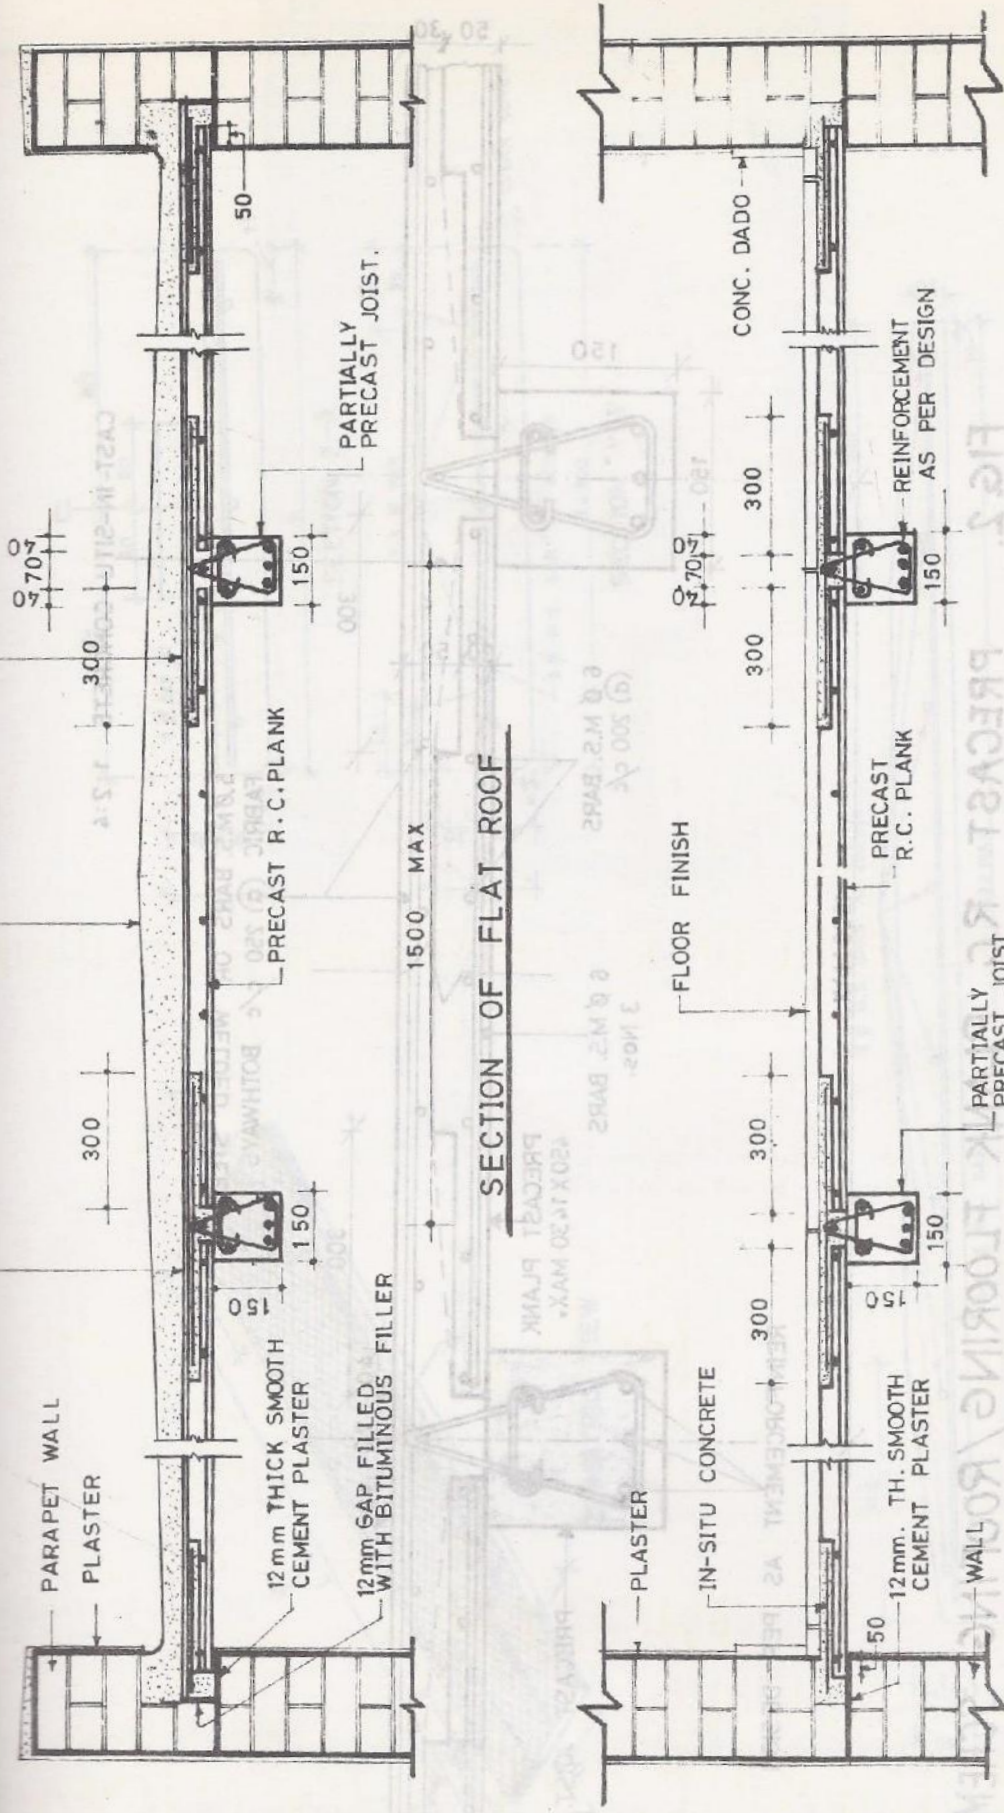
PRECAST R.C. PLANK FLOOR/ROOF
